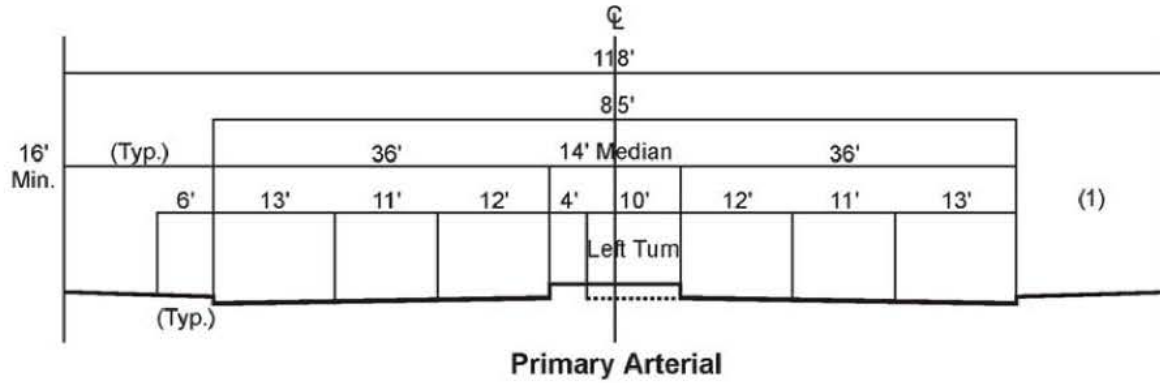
CITY OF PERRIS GENERAL PLAN ROADWAY CROSS-SECTIONS
